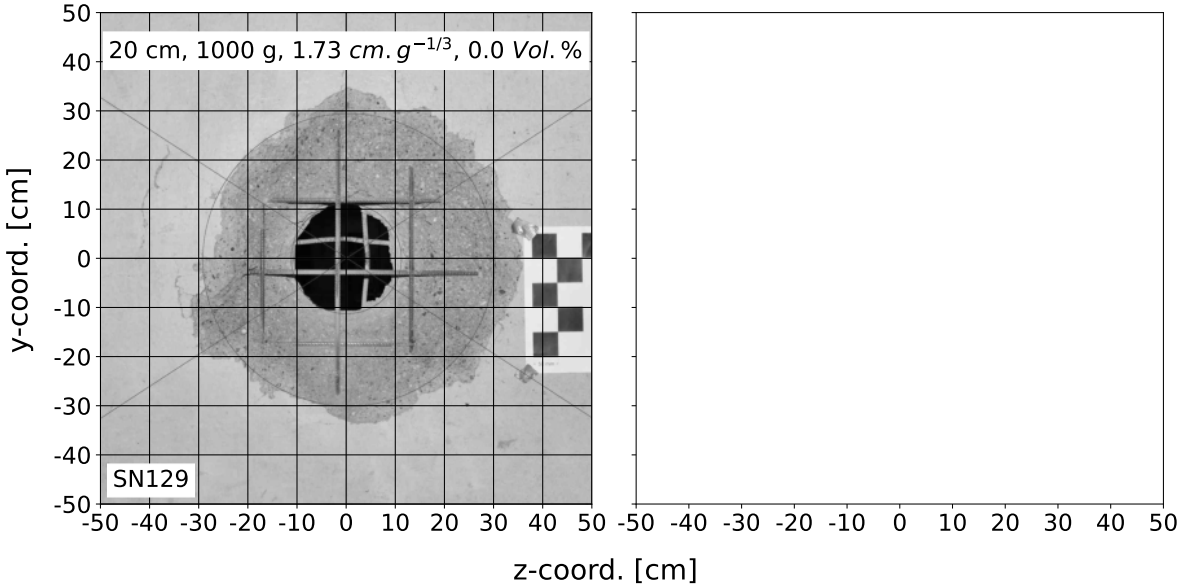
Spalling crater (without steel fibers, part 3)
